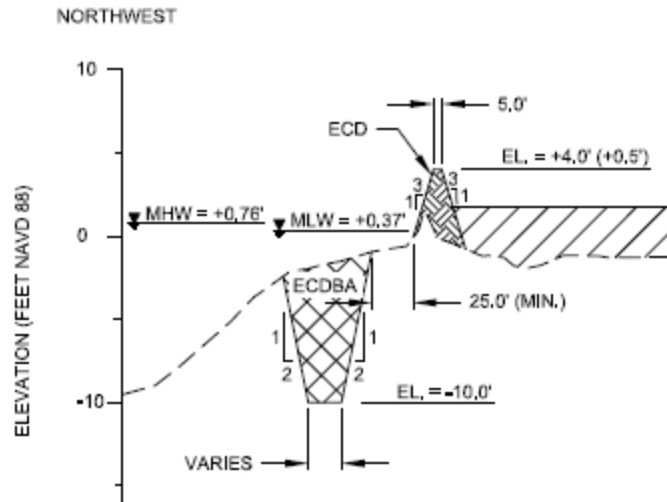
Earthen Containment Dike Typical Cross Section – Exterior Borrow
